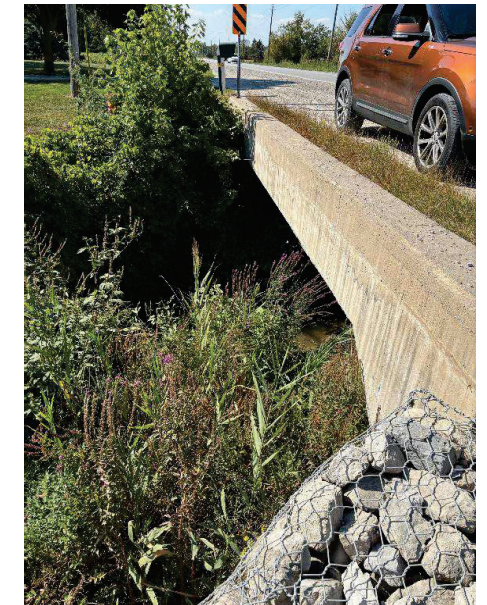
Culvert inlet at Crossing 8, south side of County Road 46.
